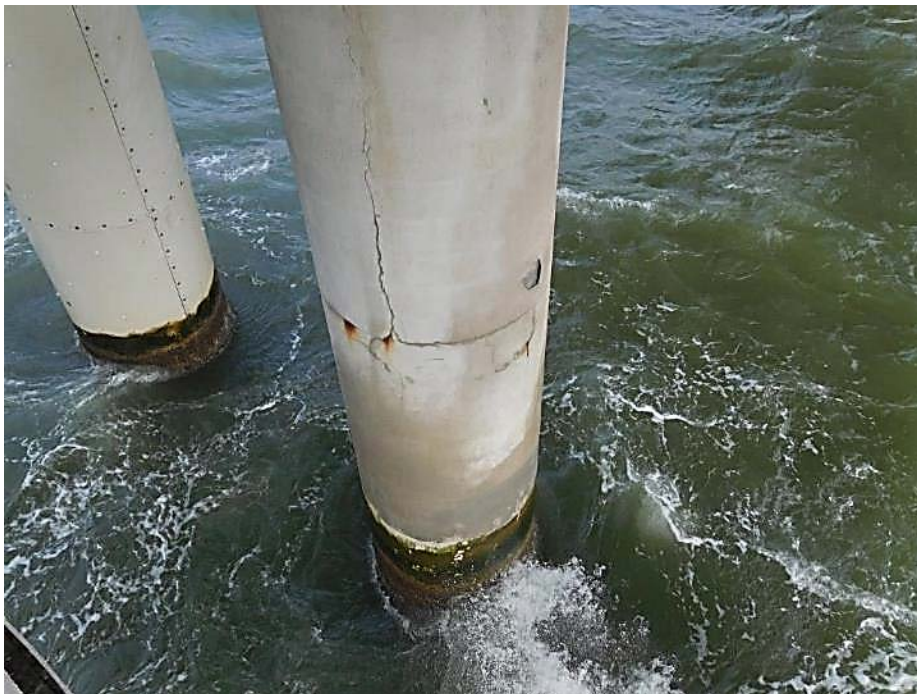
ANB122 Pile B - Protective Coating Failures with Cracking and Rust Staining (Looking Northwest)
